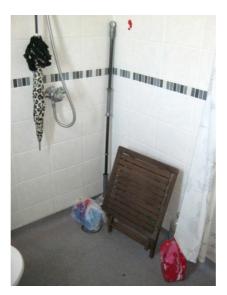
Shower room in both houses cannot be used as it floods the hallway due to poor construction.
